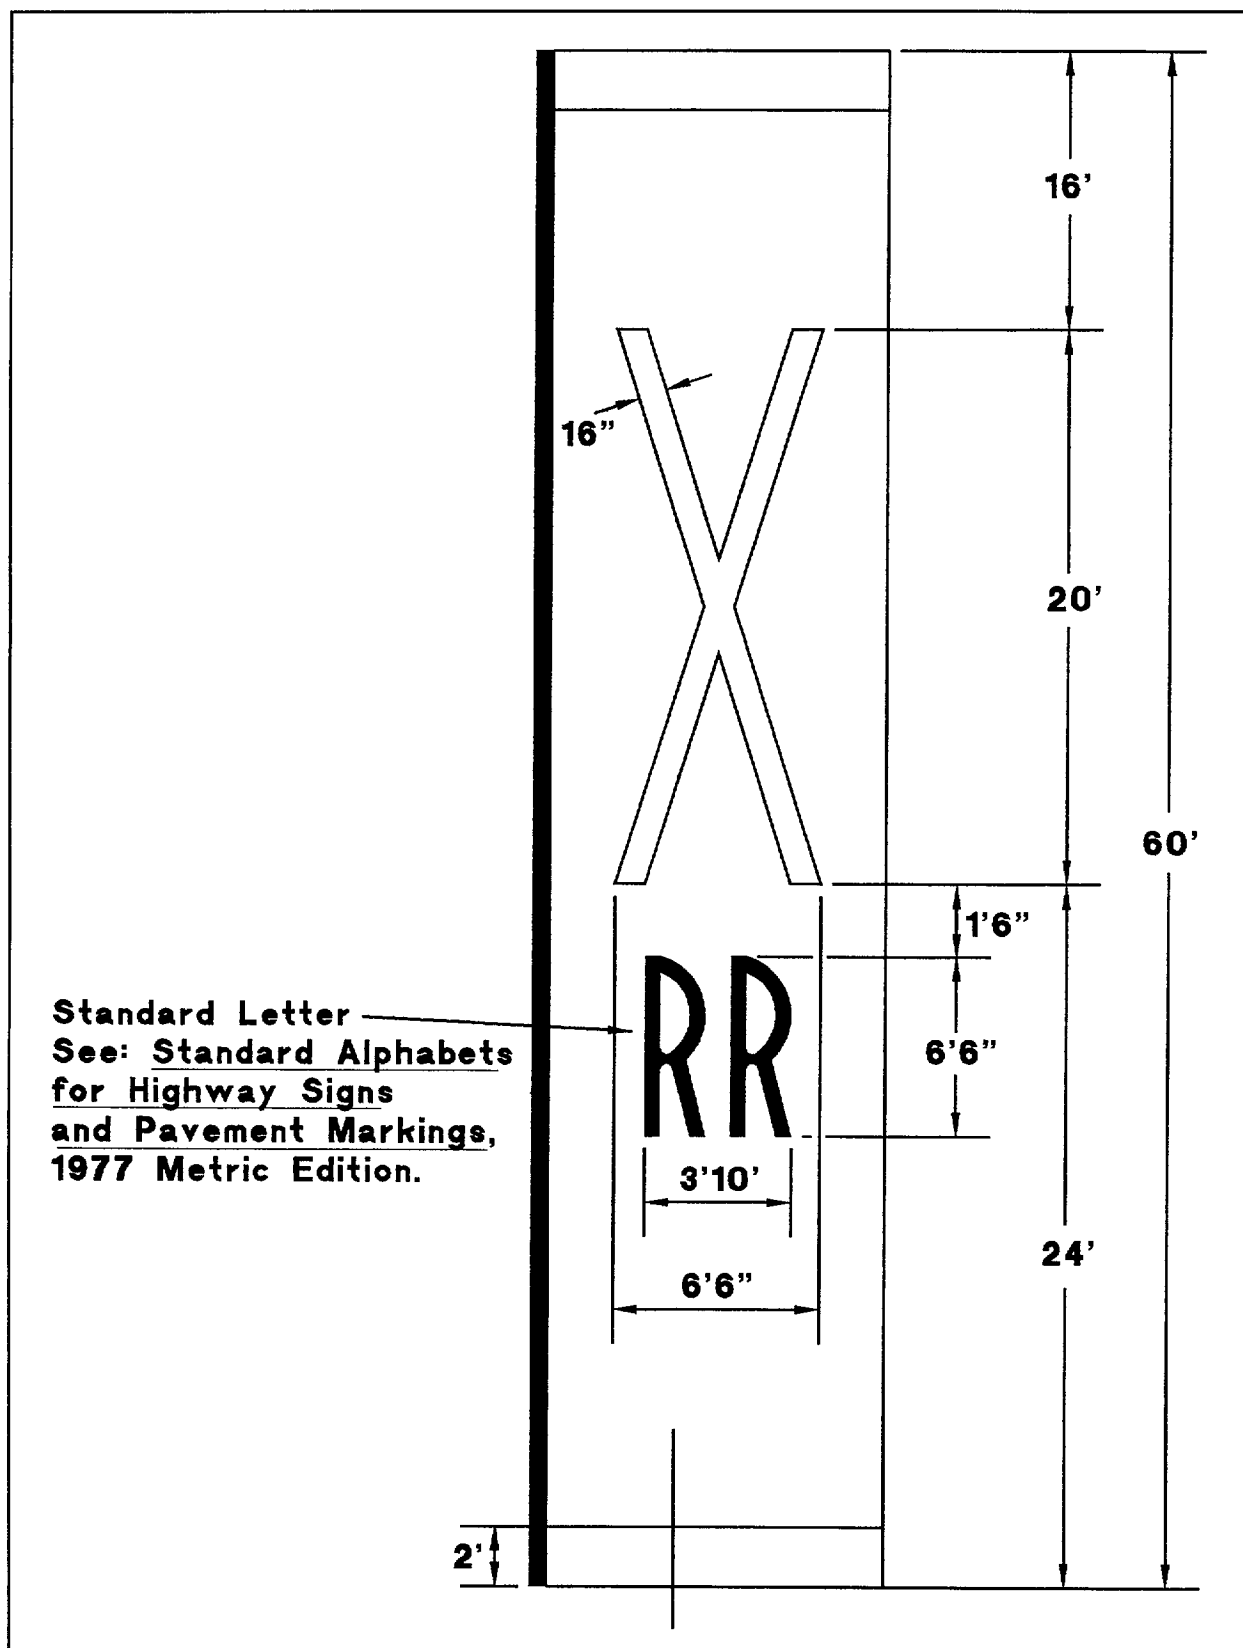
Typical placement of warning signs and pavement markings at railroad-highway grade crossings
